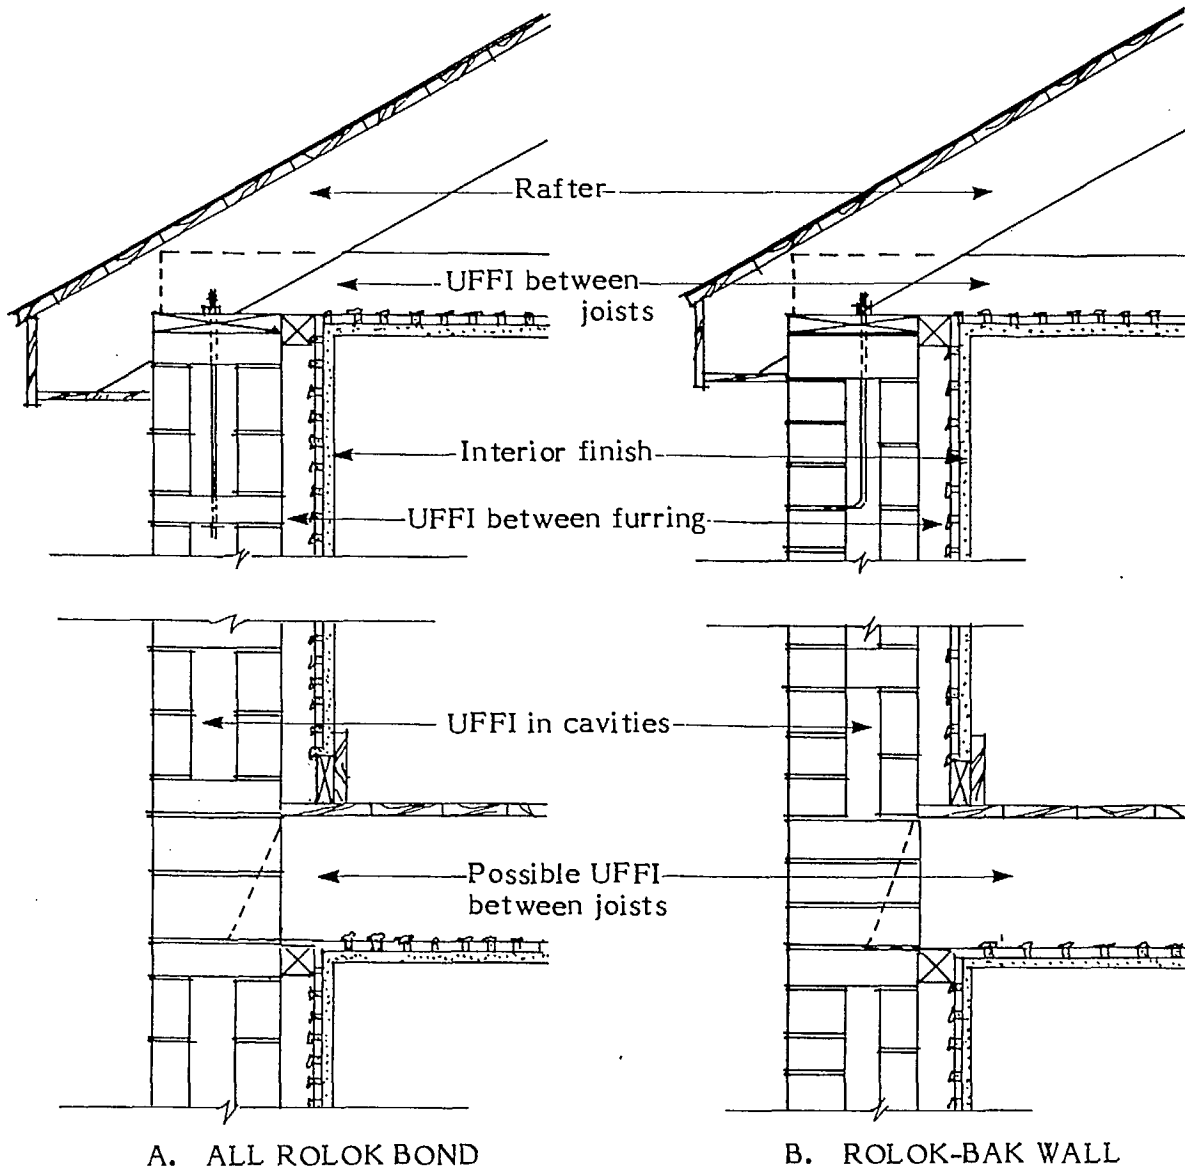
ROLOK WALL CONSTRUCTION
